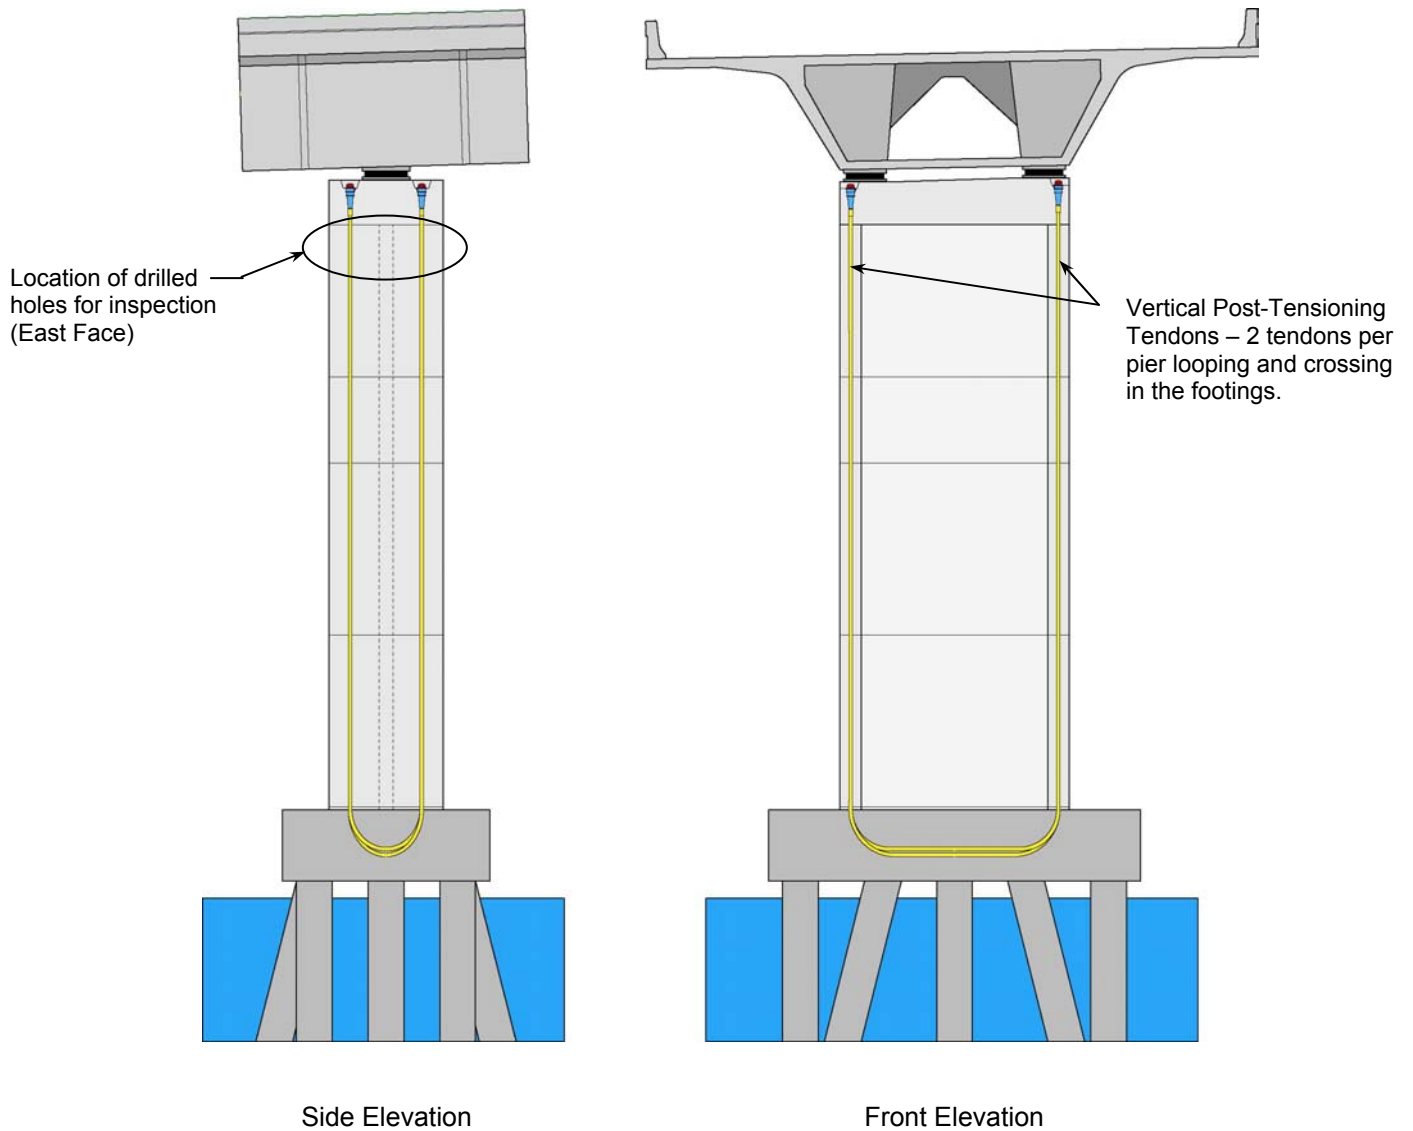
Side and Front Elevations of Precast I-Piers
